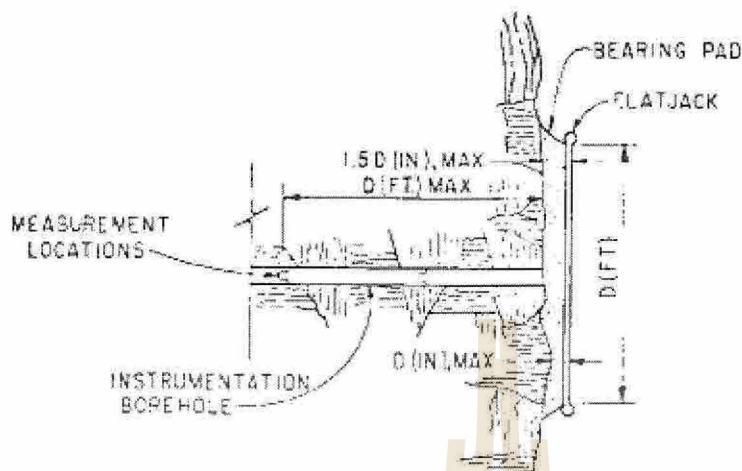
Allowable Dimensions for Rock Surface and Bearing Pad, Flexible Plate Loading Test
